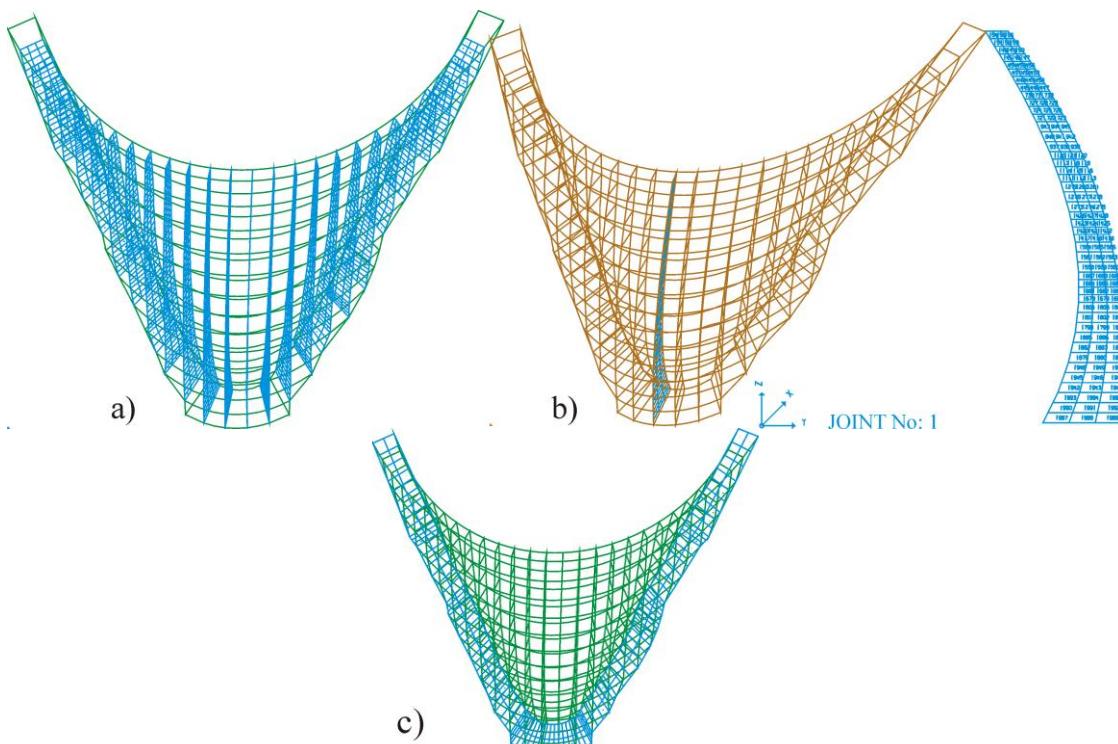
Perspective view of the mathematical model of the arch dam: a) construction joints at the vertical contacts between the monolith blocks, and b) construction joints discretized by contact elements. c) contact elements between the dam abutments and the foundation rock
